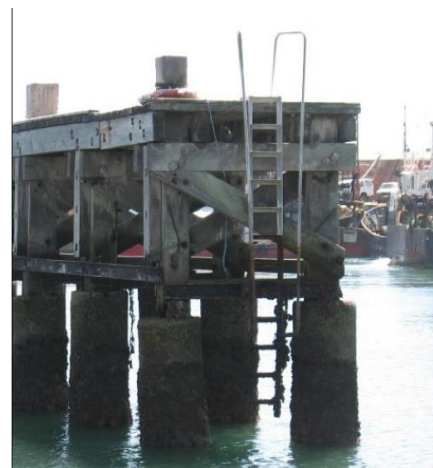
Timber decking disintegrating and wooden cross bracing in poor condition
